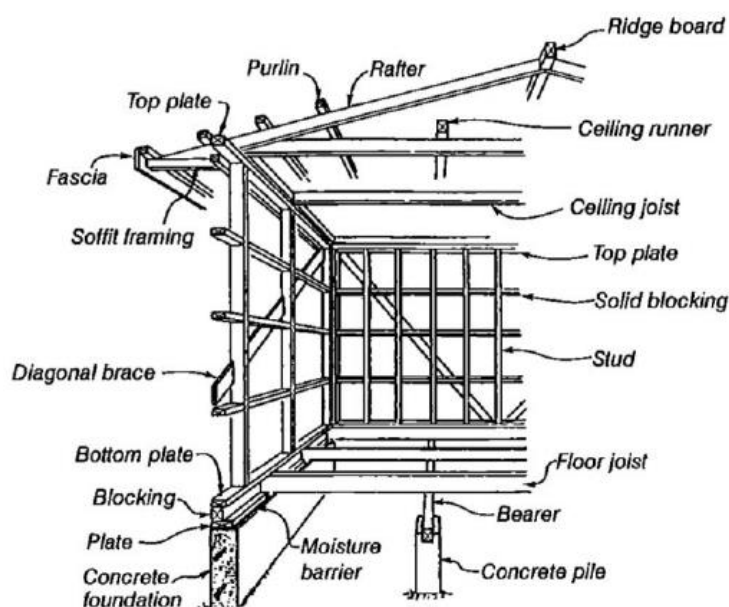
Typical light timber house framing, taken from Buchanan (2001)
